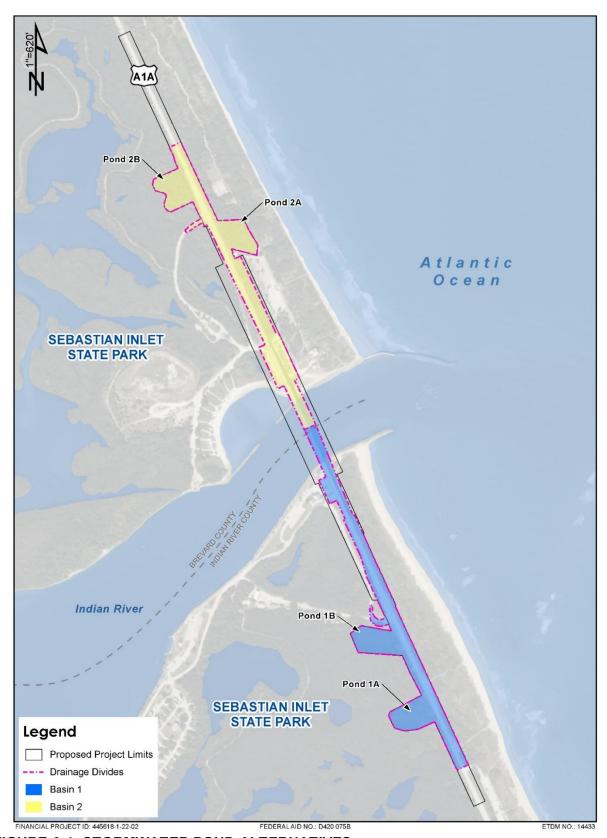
STORMWATER POND ALTERNATIVES
